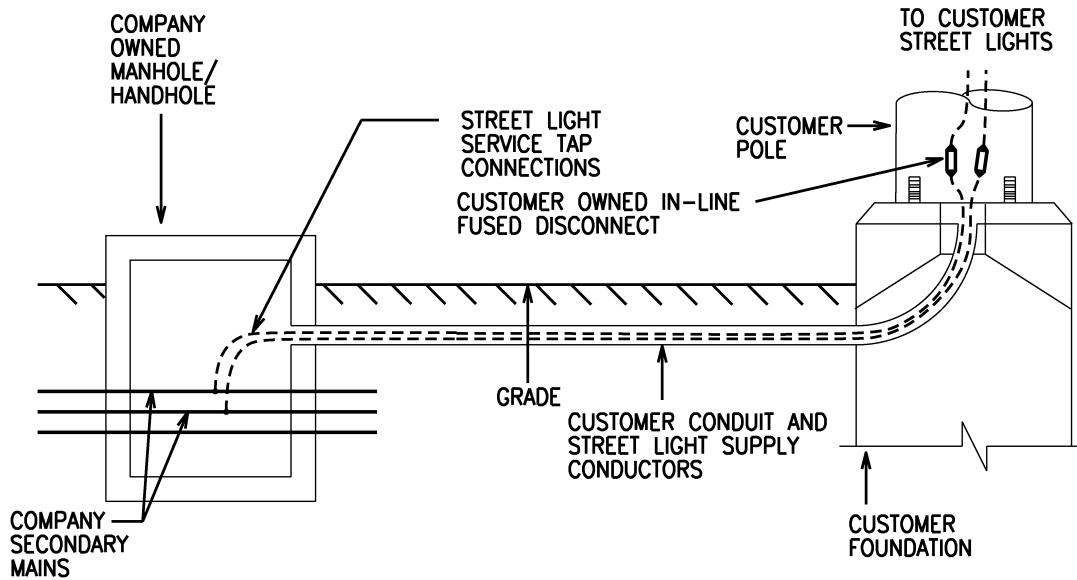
Connection of Underground Supplied Customer Owned Outdoor Light to PPL Handhole or Manhole – Non-Standard Connection
